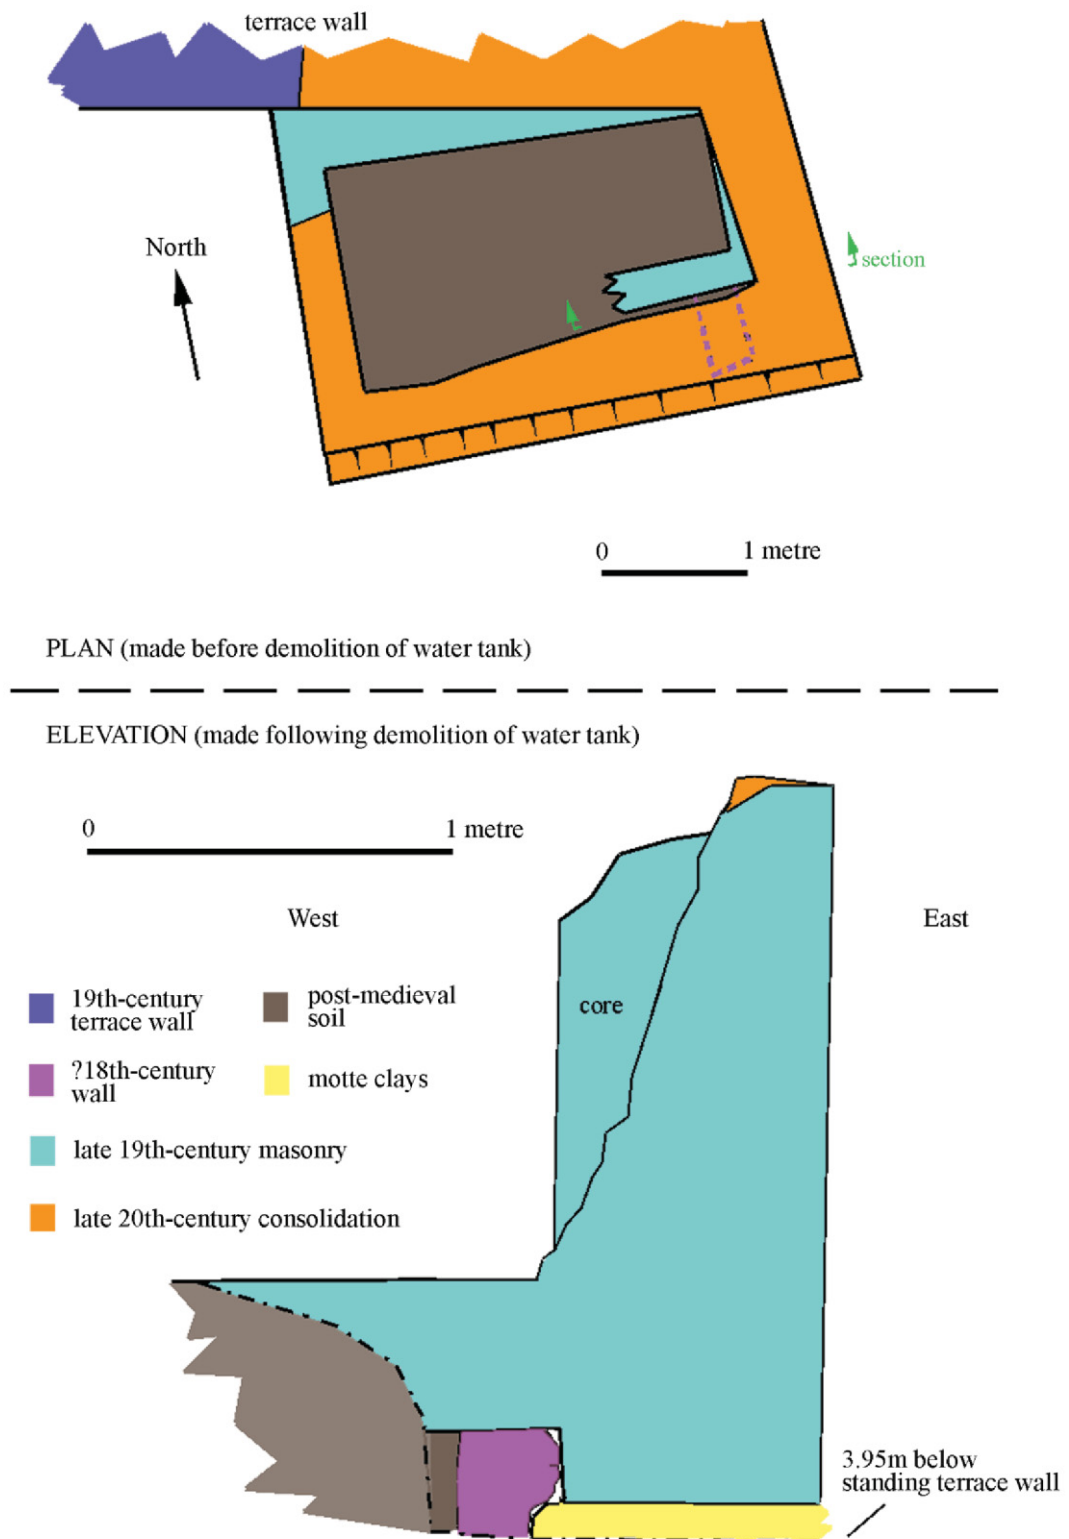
Plan and elevation of the water tank to the west of the middle wall
